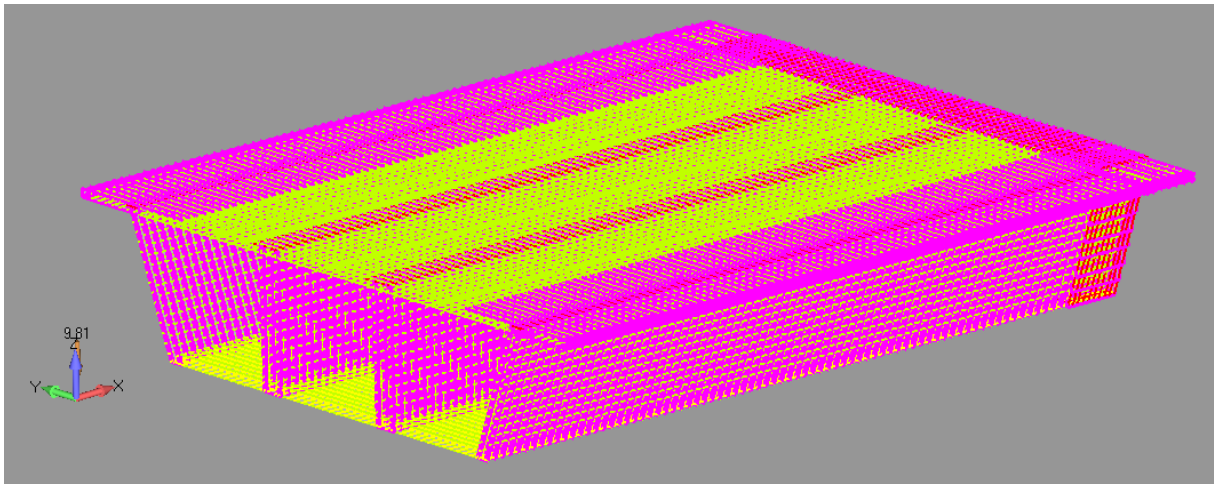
RC Bridge. Macro-element rebar mesh of the right support diaphragm and the opening O8.
